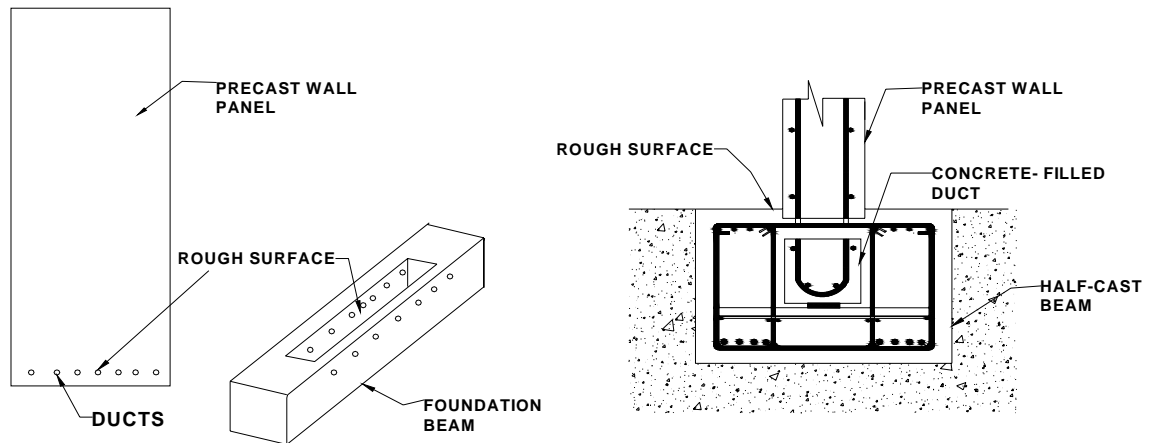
Connection detail for walls embedded in the foundation beam (Holden et al.,2003).
